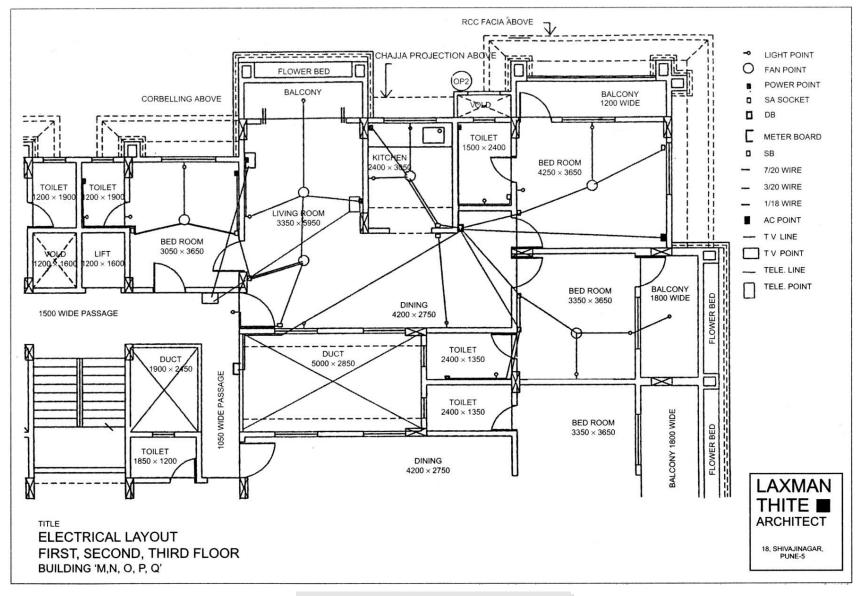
Sacred Heart Town – Electrical Layout Plan
